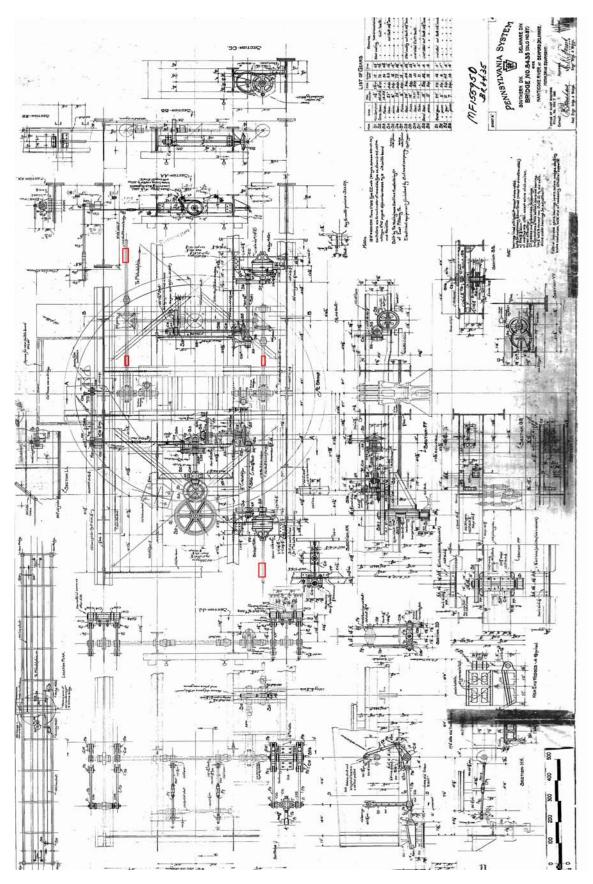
Machinery Layout at Mid Span. Red boxes indicate strain gage locations. MOVABLE STRUCTURES, INC. Excerpt from 1890s Design Plan.
